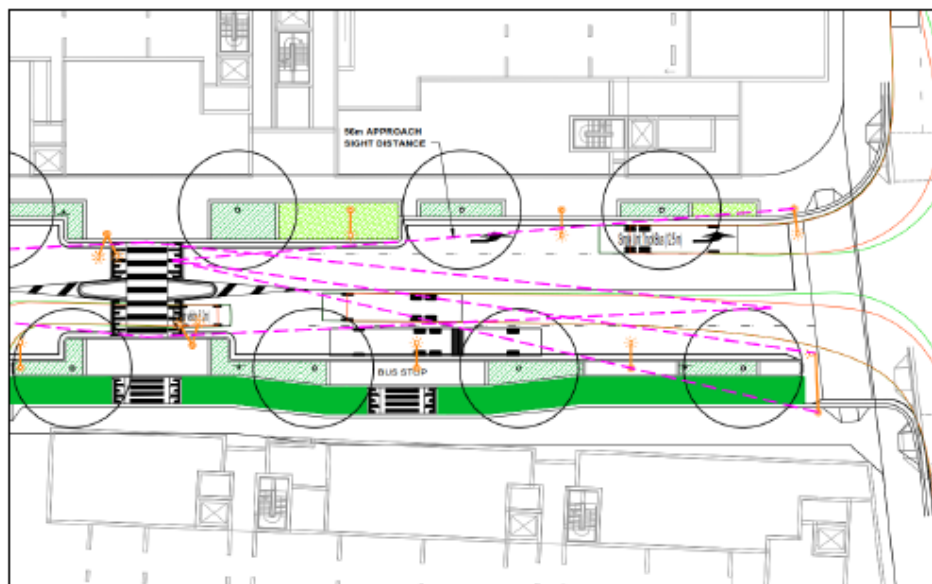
SSD assessment for O'Riordan Street – Connector Road intersection (east)
